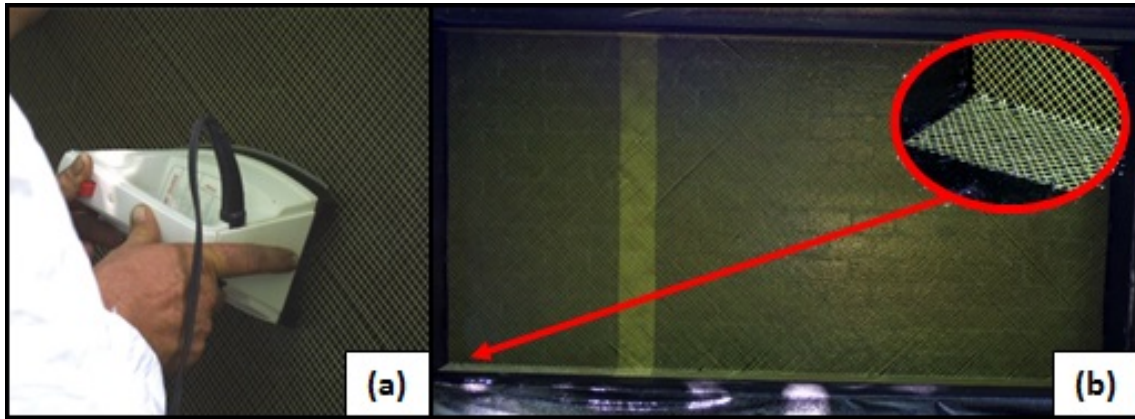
Subscale fabric. (a) Hot iron used in subscale experiments to adhere fabric to wall. (b) A 3 in. of fabric overlapped top and bottom supports.
